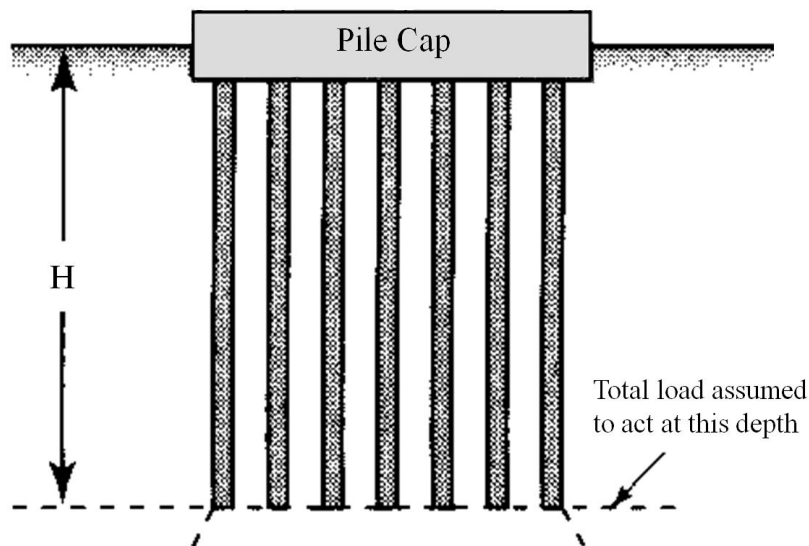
The retreat distance of null-neighbor-damage building relevant to foundation bearing capacity
